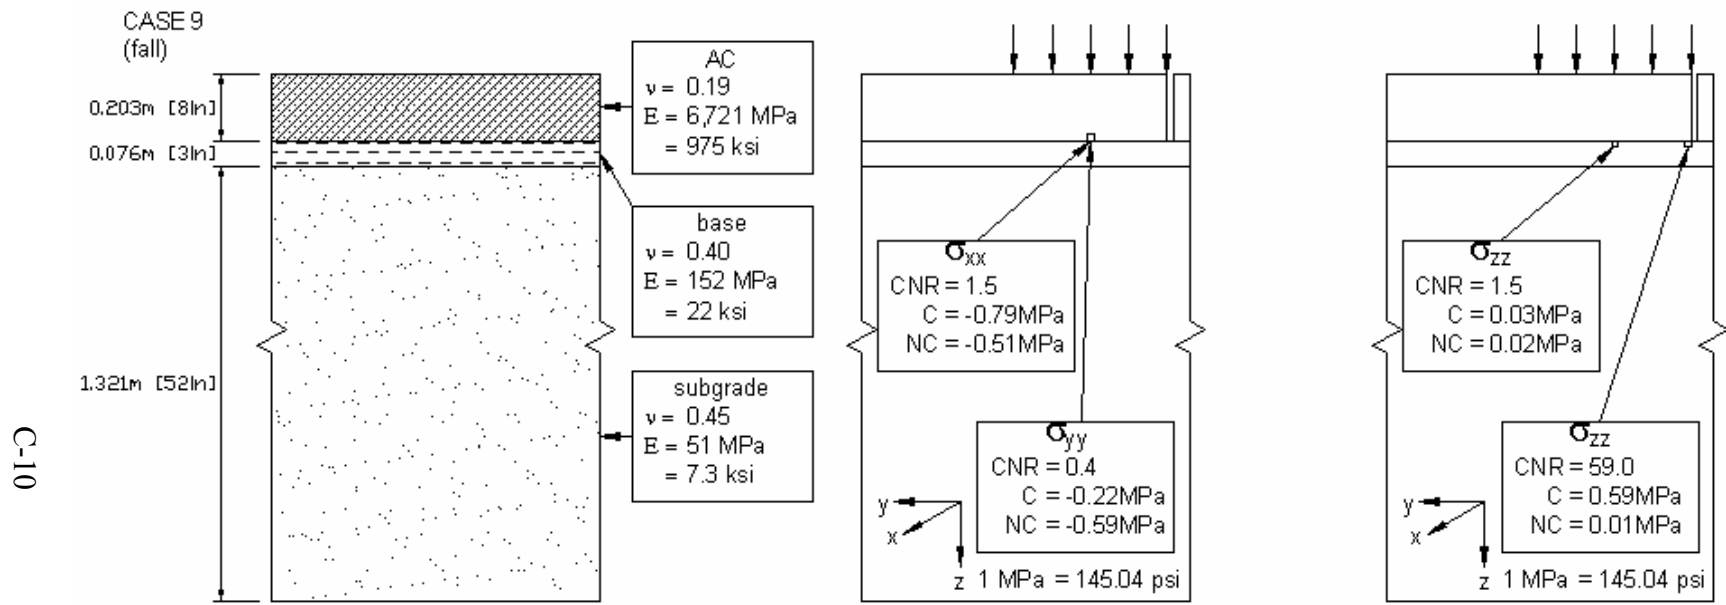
Summary cross section for case 9, (C – stress in cracked pavement, NC – stress in pavement with no crack, CNR – crack/no crack (stress) ratio)
